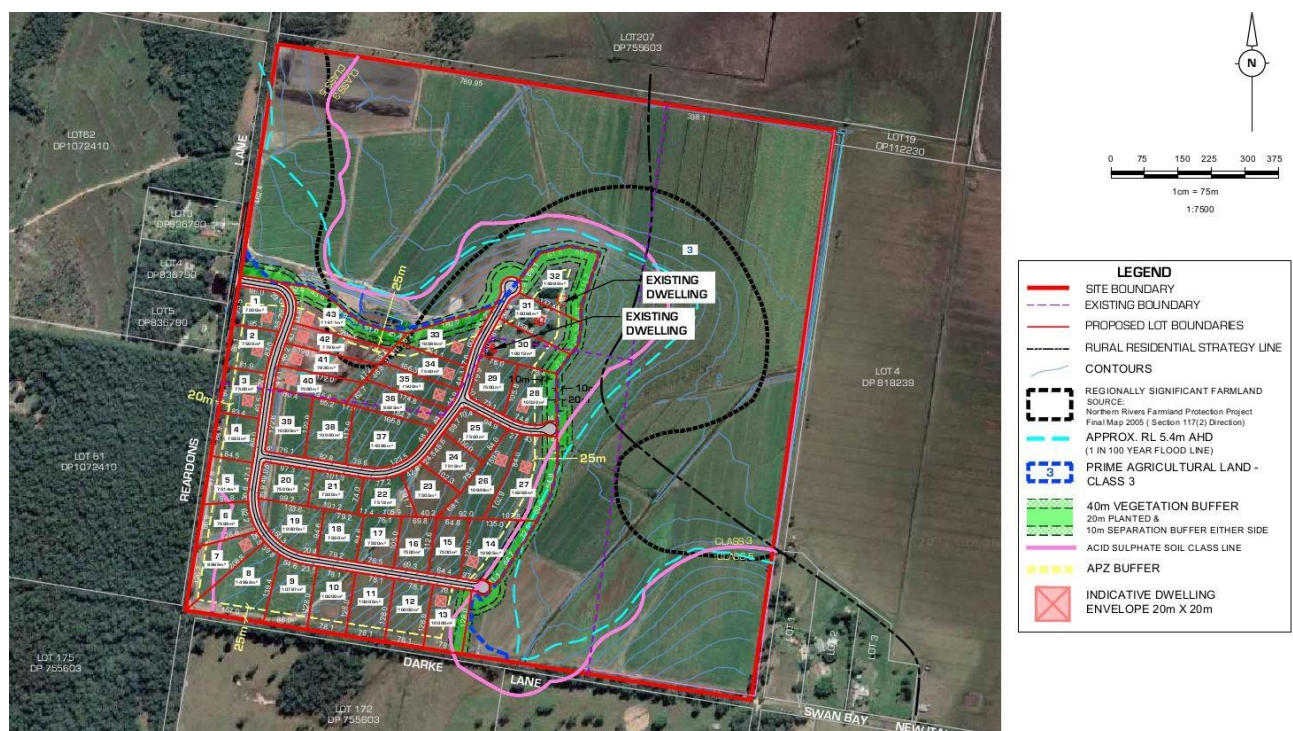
Concept subdivision layout extracted from Planning Proposal PP2022/0001
